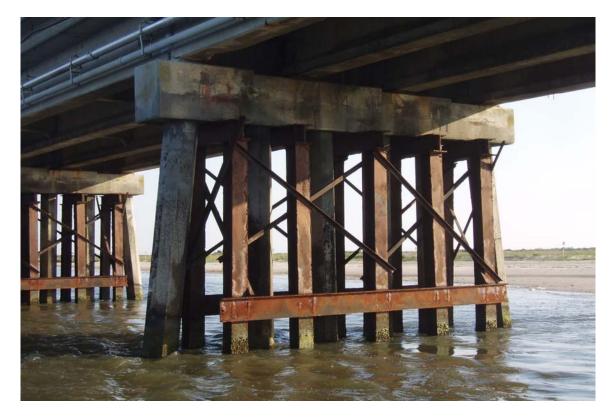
TYPICAL CONFIGURATION OF APPROACH BENT SUPPLEMENTED WITH H-PILES (BENT 115 SHOWN)
